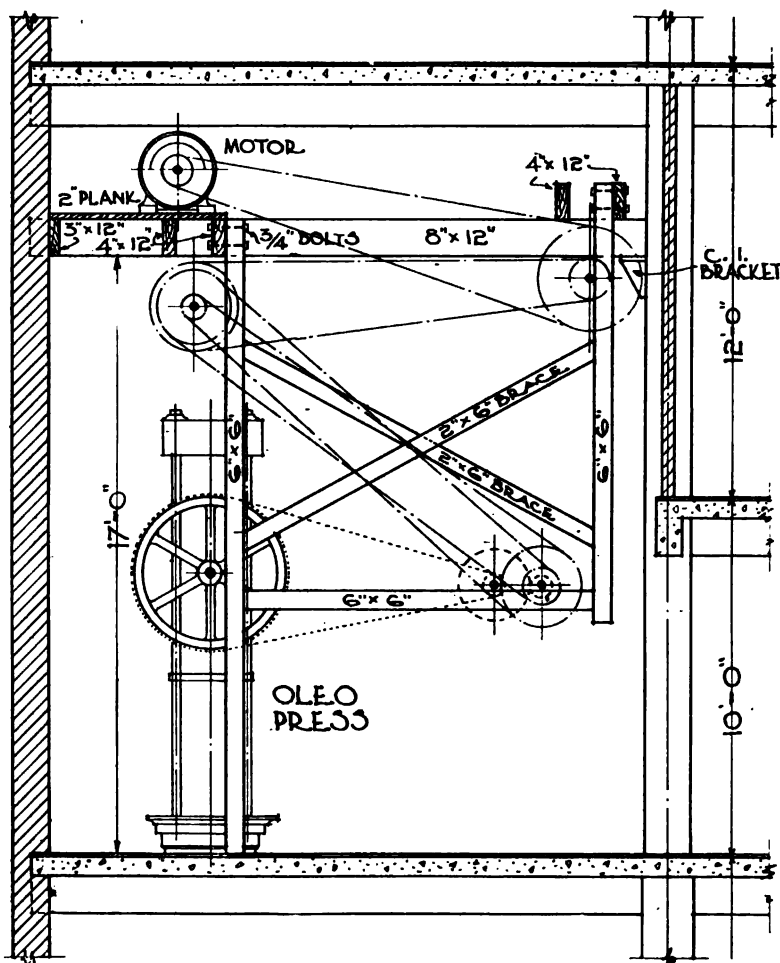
SECTION SHOWING DRIVE FOR OLEO PRESS.
